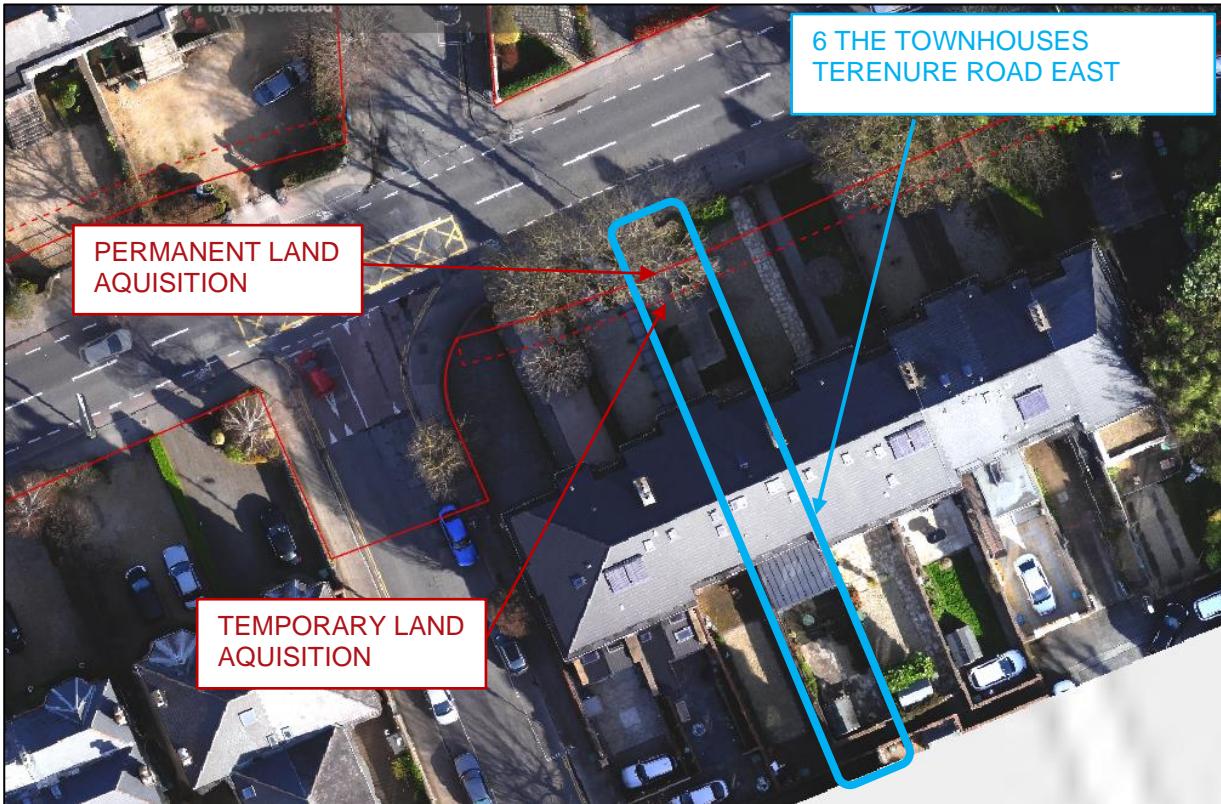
Proposed Land Acquisition lines adjacent to 6 The Townhouses Terenure Road East
